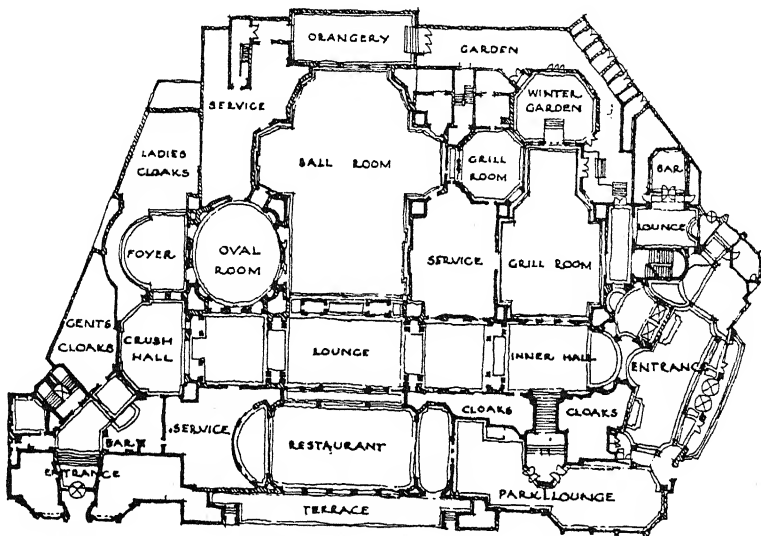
The ground-floor plan of the Dorchester Hotel, London (W. Curtis Green and Partners) is remarkably free from stanchions. Loads are concentrated on a few widely spaced points of support.
